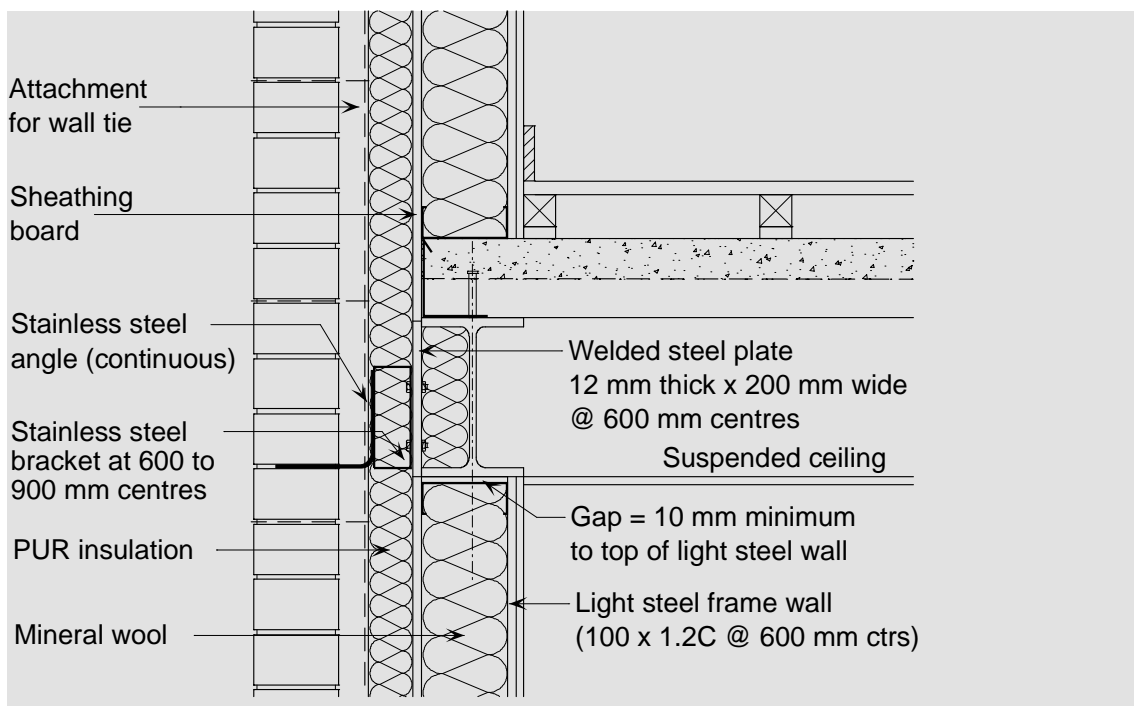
Brickwork supports using stainless steel brackets and angles at each floor in a steel framed building
